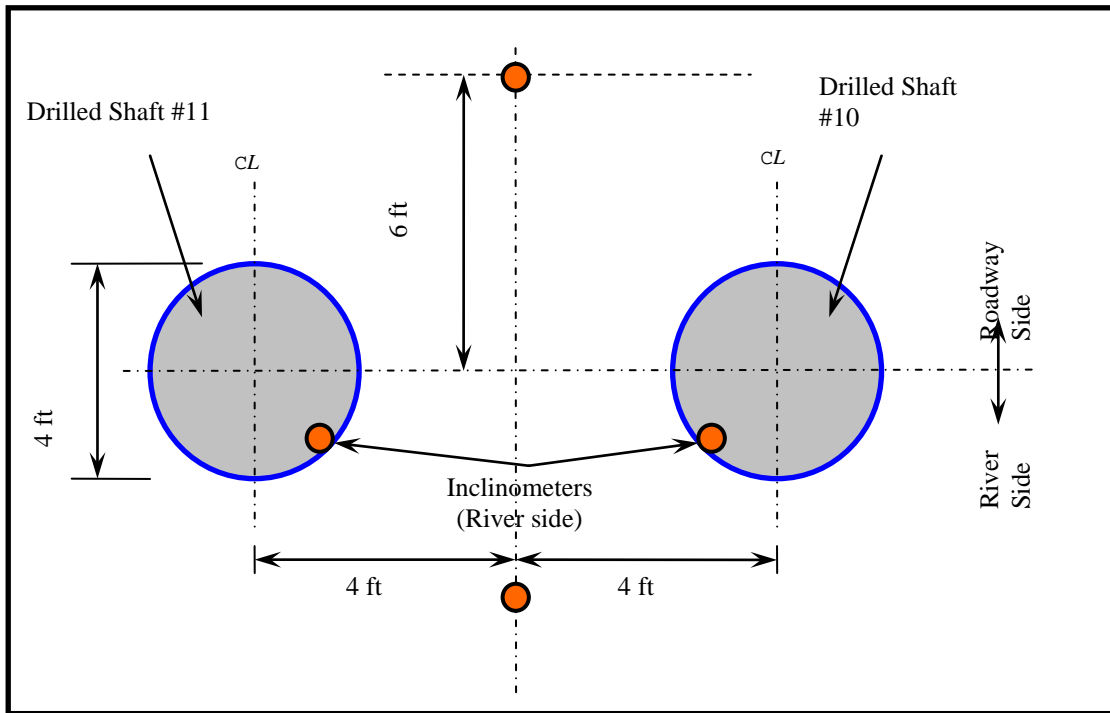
A Schematic Plan View of Inclinometer Location at the MRG-376 Site
